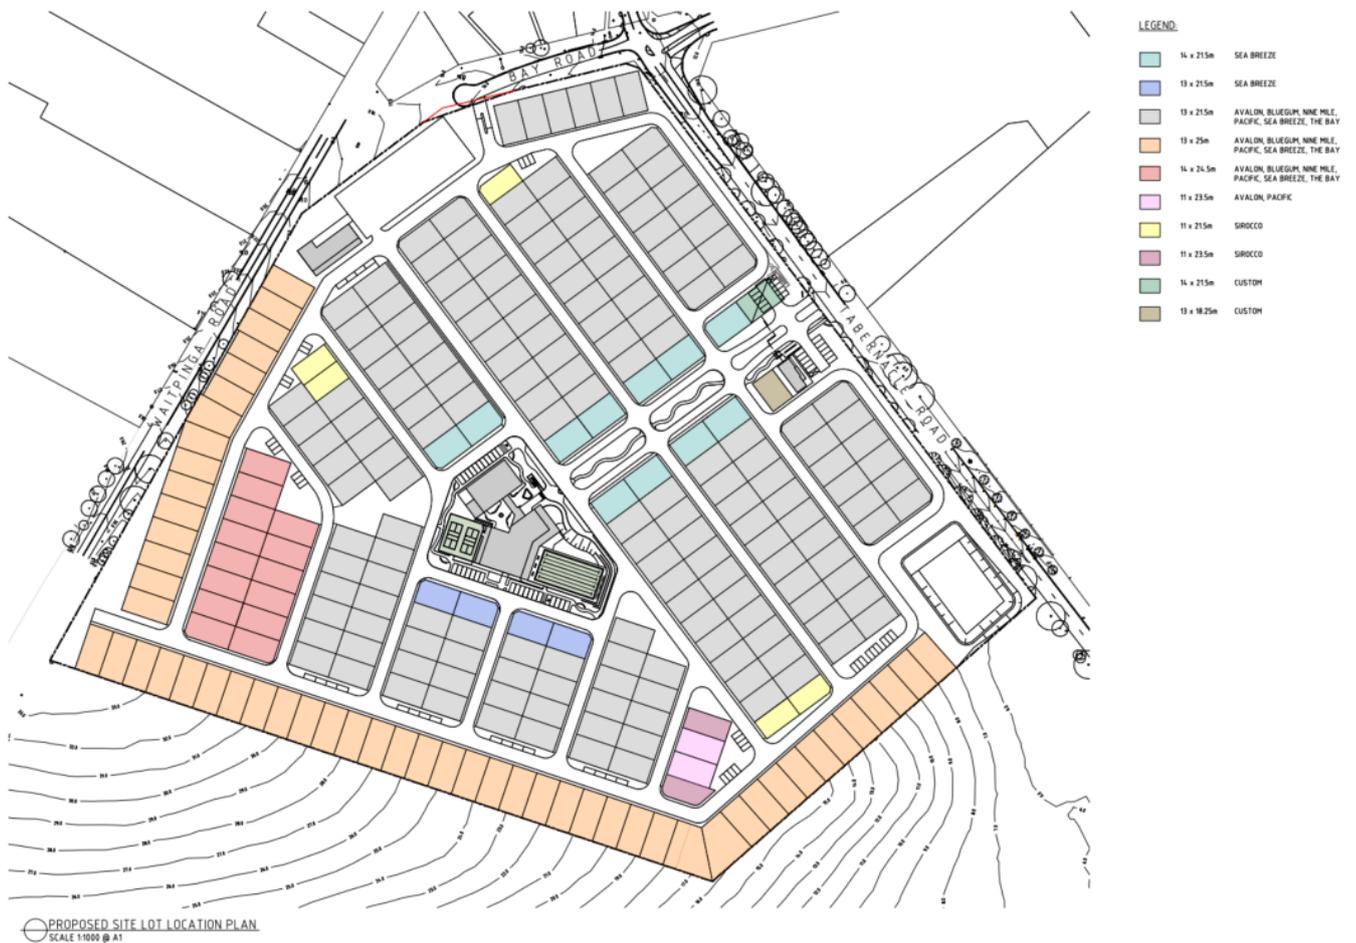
Site layout and dwelling/lot typologies (Aube)
